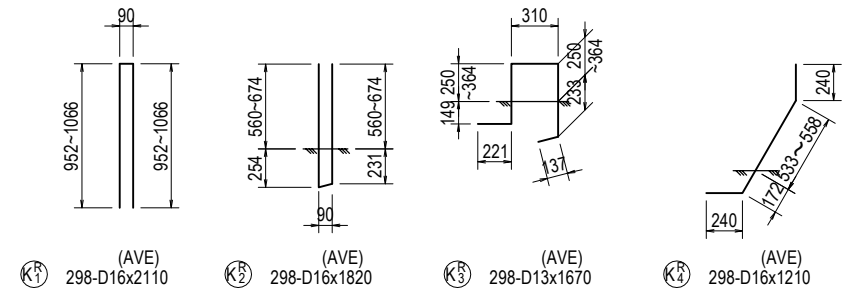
# DETAIL OF CONCRETE CURB, BARRIER AND MEDIUM (PF5-PF7) (2)
